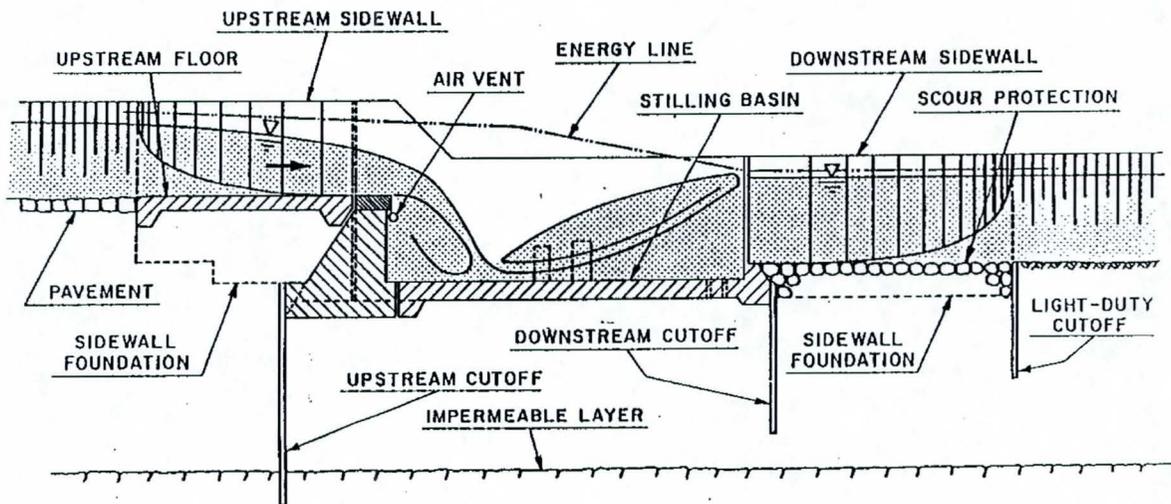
Standard design cross section of vertical drop structure (after von Hausler 1976).
